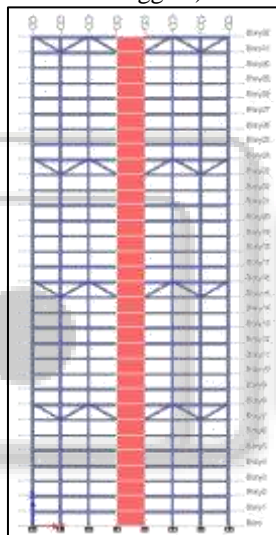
Sectional Elevation of Building Model 3 (With V Outriggers)
